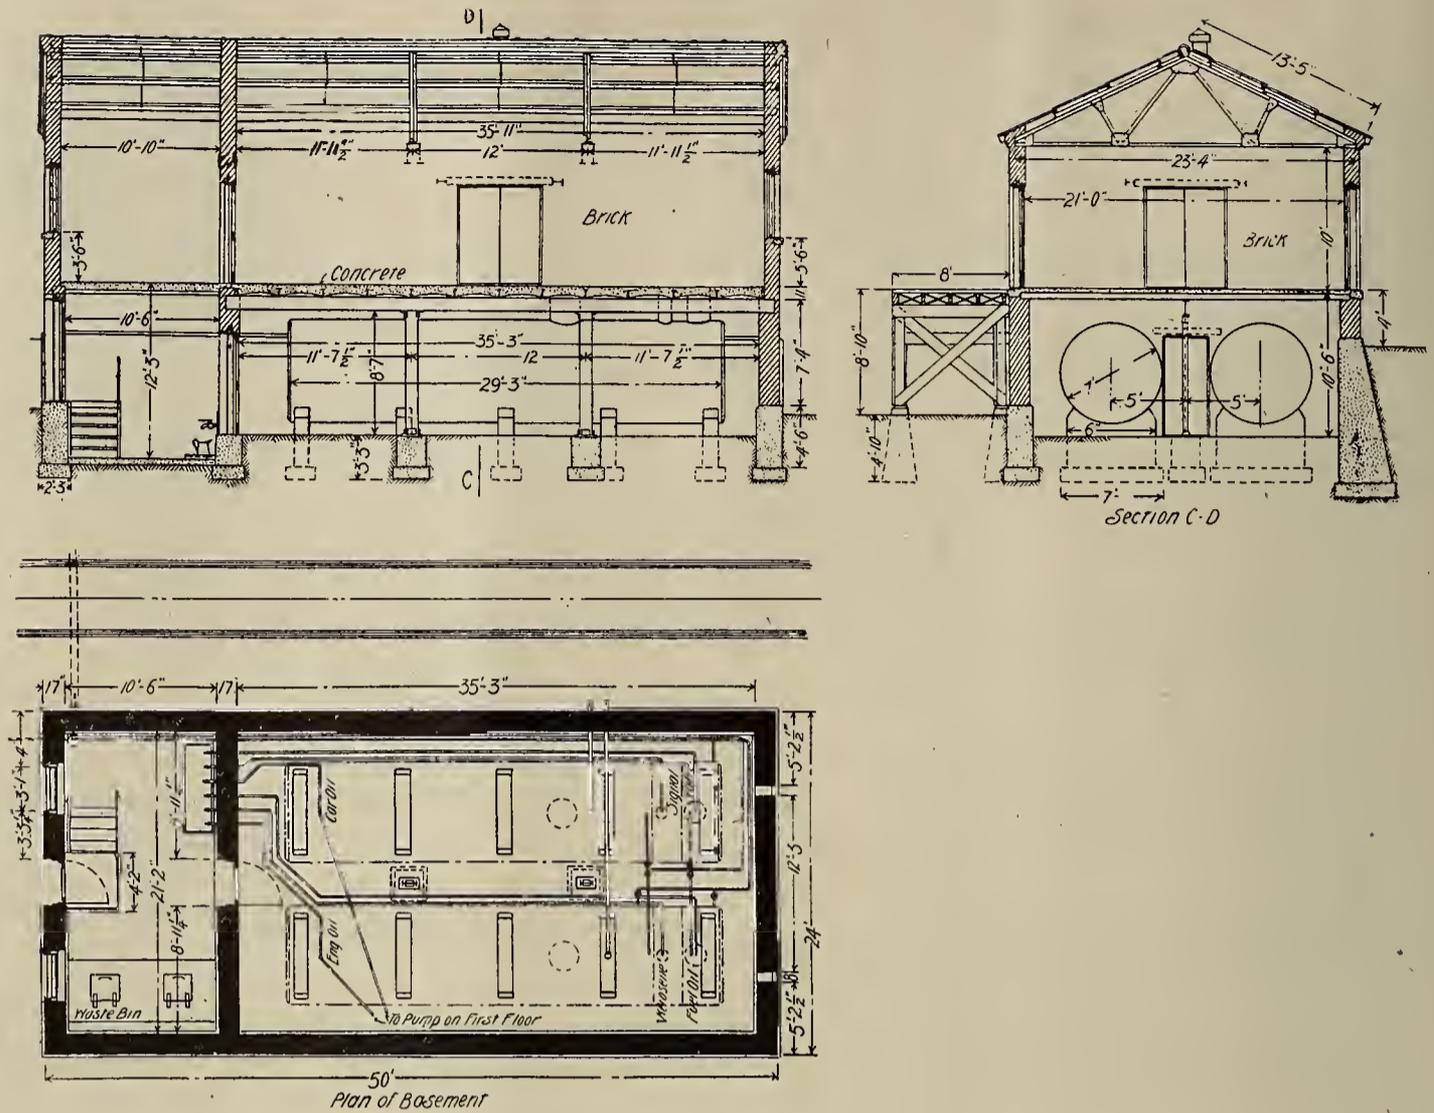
PLAN AND SECTIONS OF OIL HOUSE—C., L. S. & E. RY.
